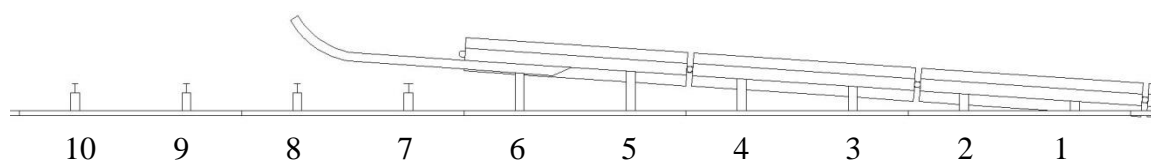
MGS Fully-Blocked Rail and Cantilever Beam – Impact Locations
